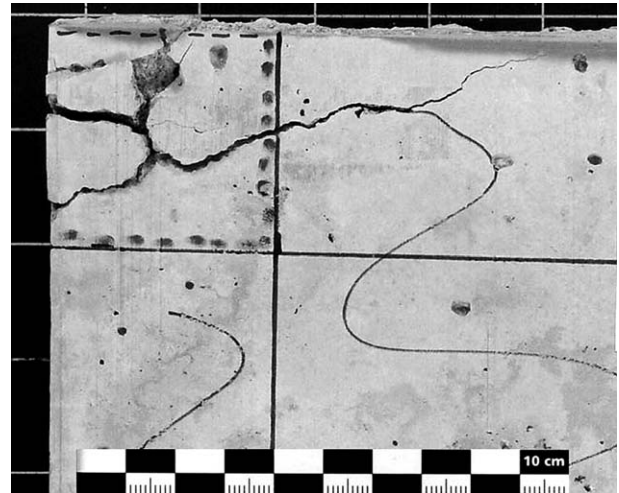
Spalling of a corner at a cube of a laboratory sample.
